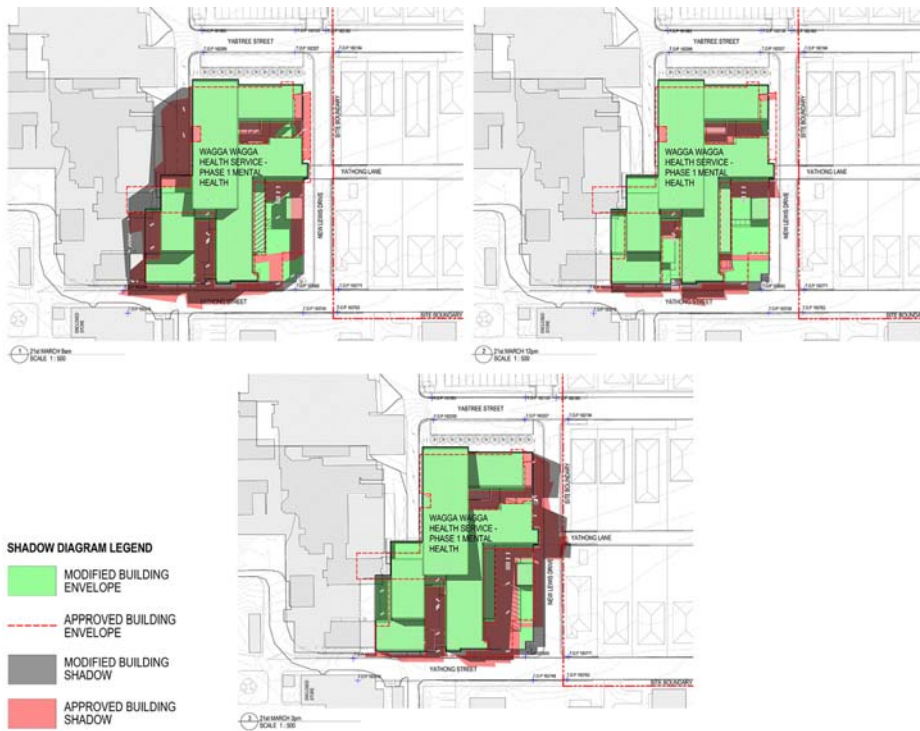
Shadow impact during equinox (March 21) (Source: Woods Bagot)
